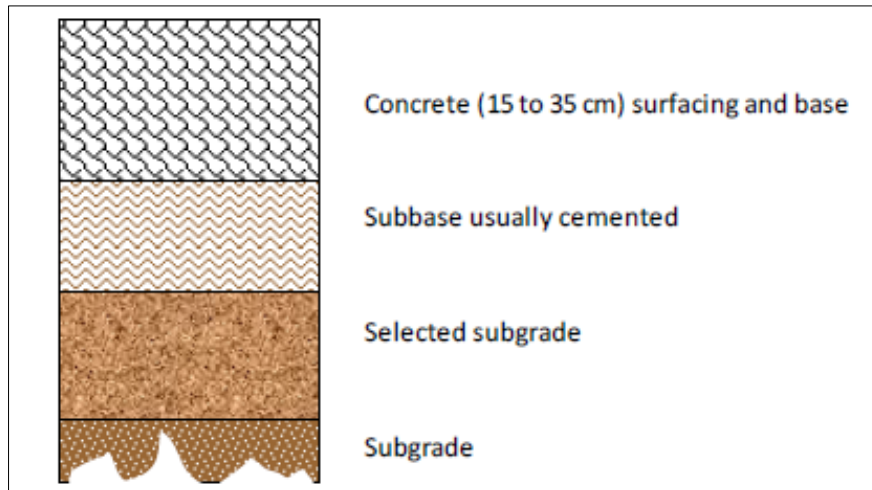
Rigid pavement structure (South African Pavement Engineering Manual (SAPEM), 2013a)
